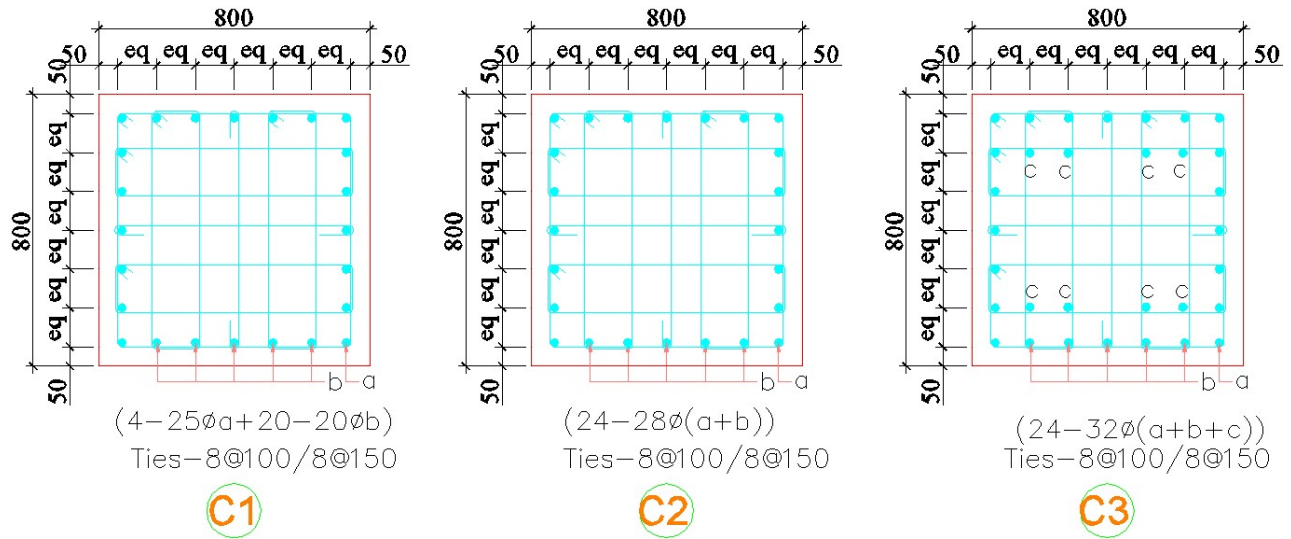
(e) - Typical details of columns at base level showing location of bars and their notation along with reinforcement details.
